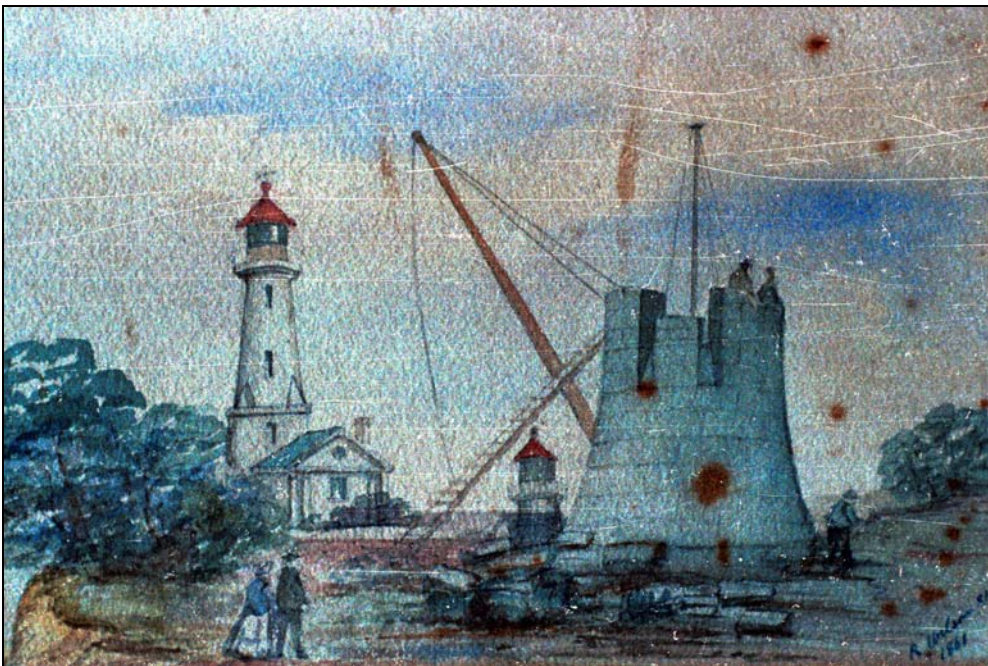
9: Shortland's Bluff lighthouses, 1861. From Left: Original Lighthouse (1842), Low Light Timber Lighthouse Tower, and High Lighthouse under construction (From Watercolour by R Wilson, Photo WD54, QHM Collection).
